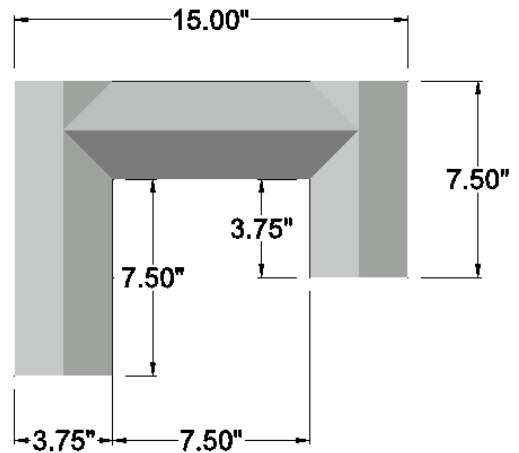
Model $C2_{gable\&flat}$ dimensions - top view
